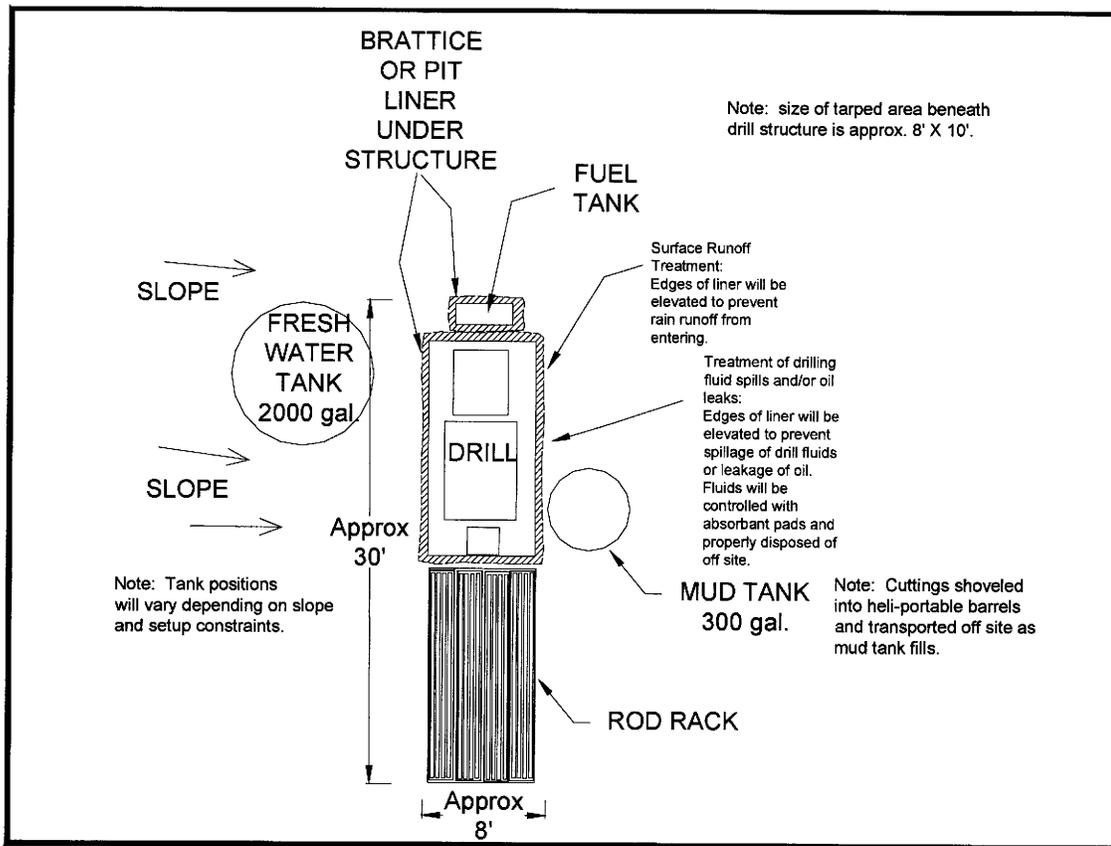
Typical heli-portable drillsite setup. Note: The drill may be left on a small flatbed truck for site UCP-A without setting the skid on the ground.
